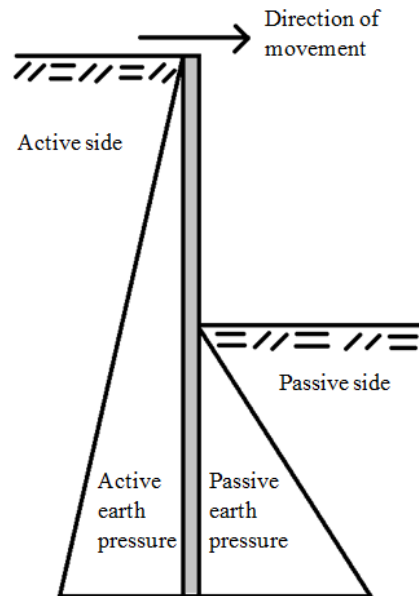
Illustration of active and passive side for an excavation supported by a retaining wall.
